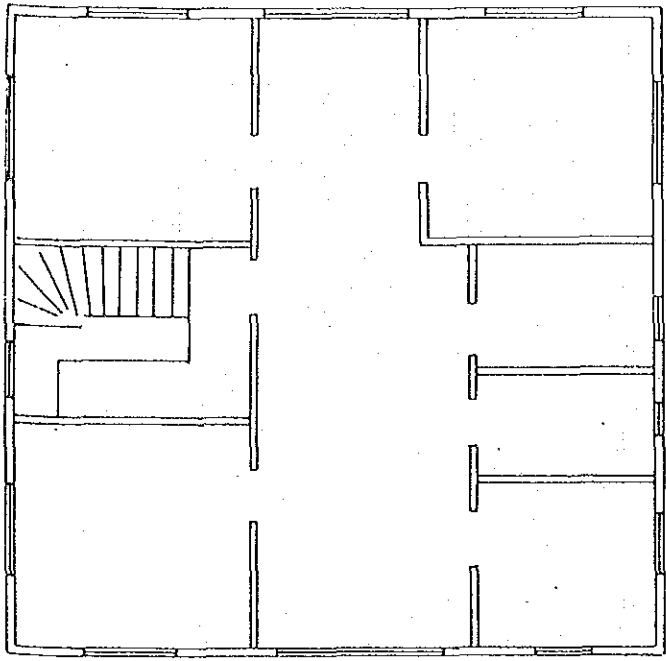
PLAN OF TIMBER FRAME BUILDING IN BOLU
